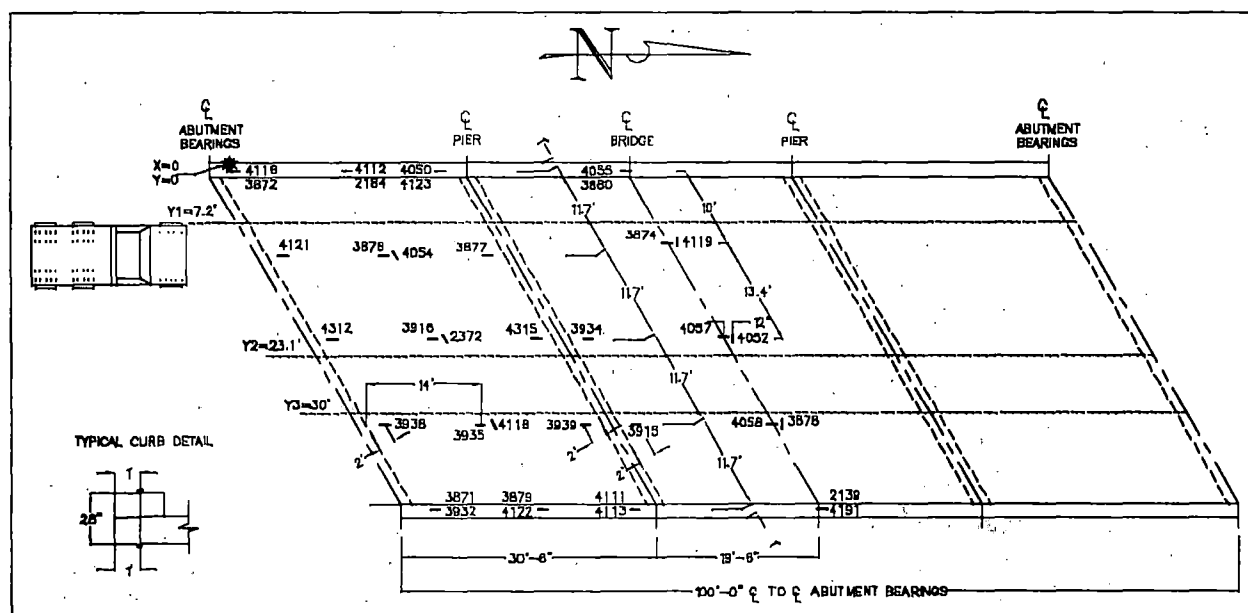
I-29 over Cleghorn Ditch - Instrumentation Plan.
